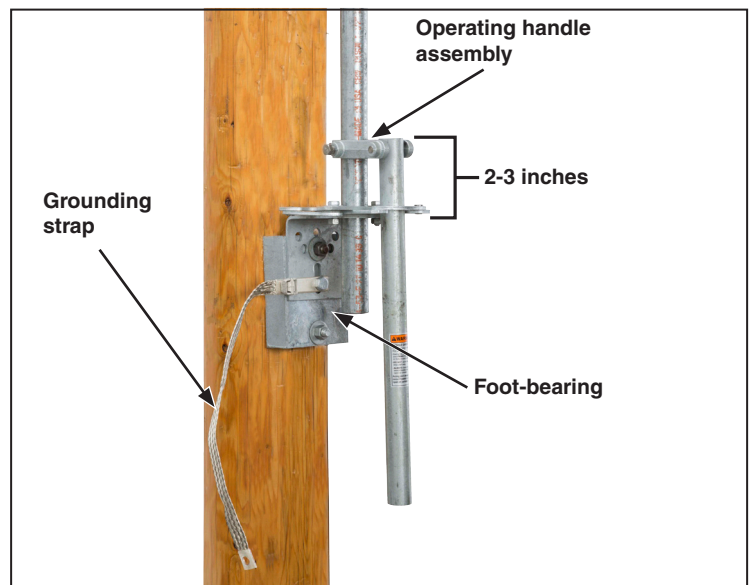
Install the foot-bearing assembly so the handle is 2 to 3 inches above the handle yoke.
